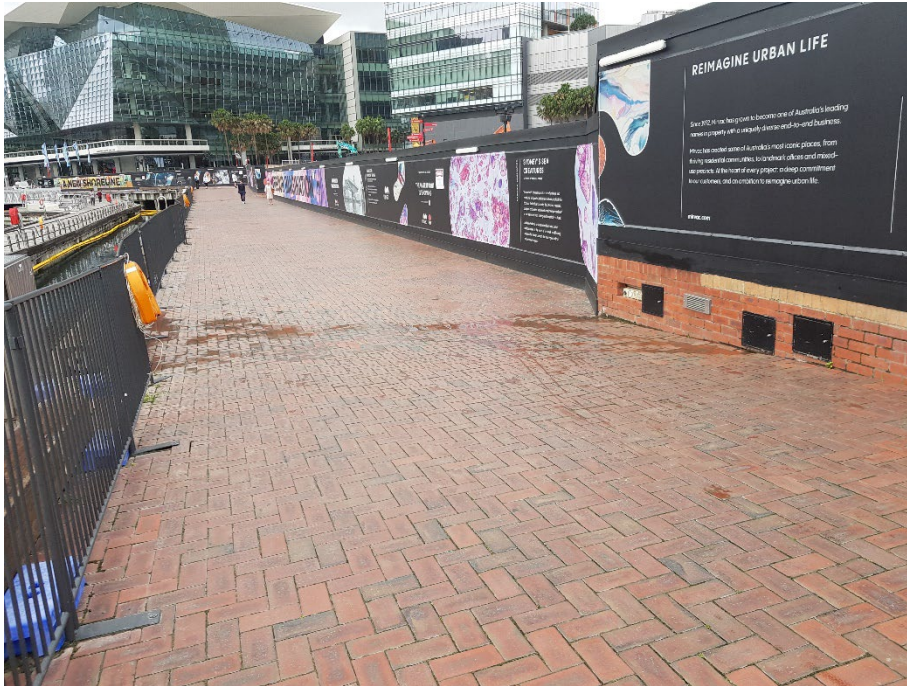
Looking south along the boardwalk and eastern site boundary. Minor seepage from the site's brick wall site that appeared clean. 16/01/24
